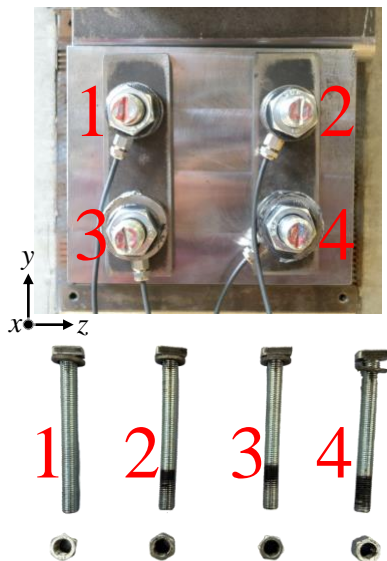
After test conditions of the saw-tooth surfaces / CC-01.
